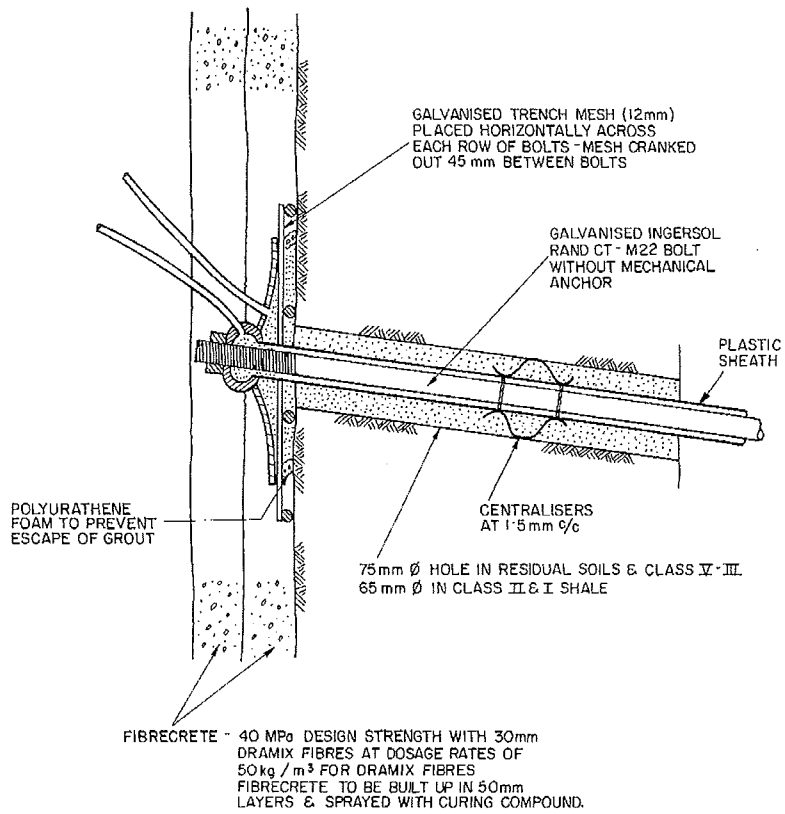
Bolt head, fibrecrete and trench mesh layout in section.
